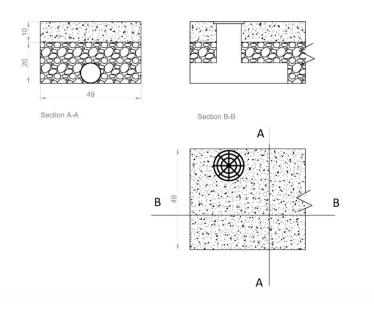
IES details: plan view, section A-A (longitudinal section) and B-B (cross section).
